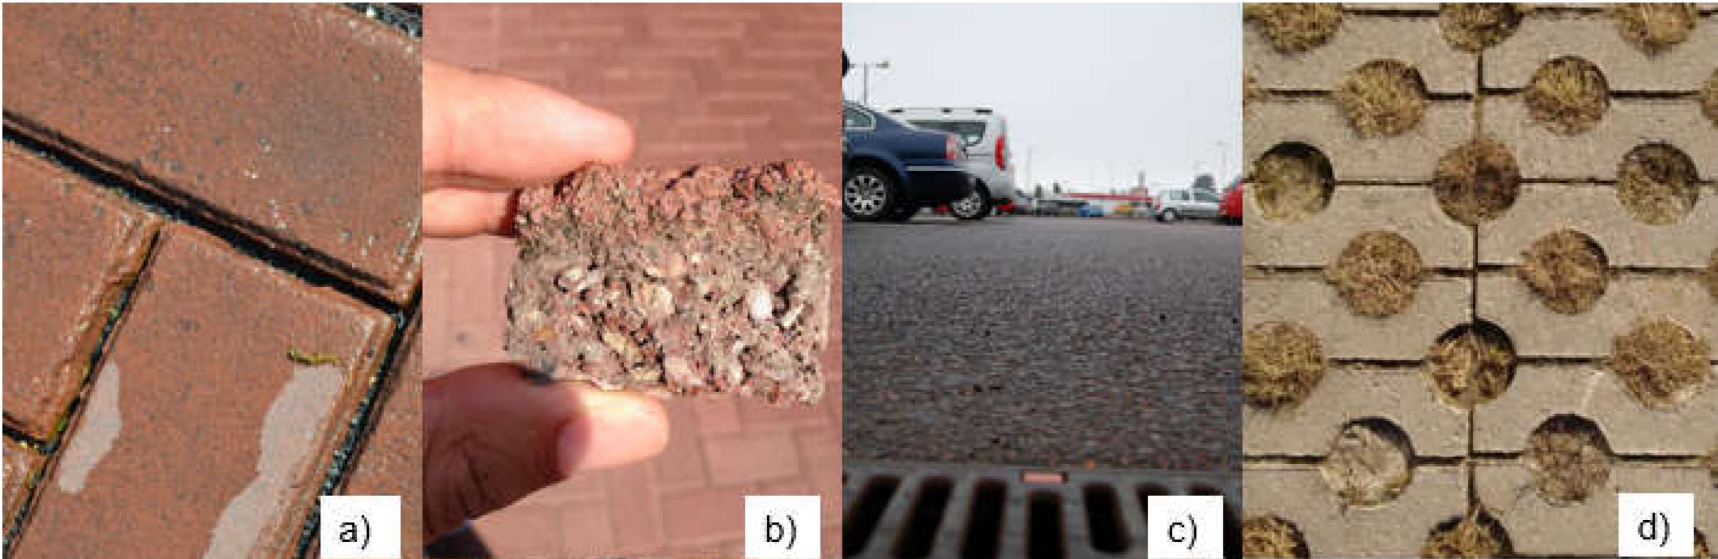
(a) Impermeable concrete interlocking pavers; (b) porous concrete; (c) porous asphalt; (d) plastic grid pavers.
